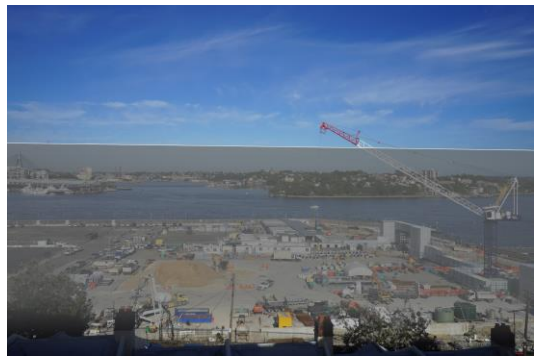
Proposed Building Envelope. Level 2 of The Langham Hotel, facing west (prepared by Digital Line).
